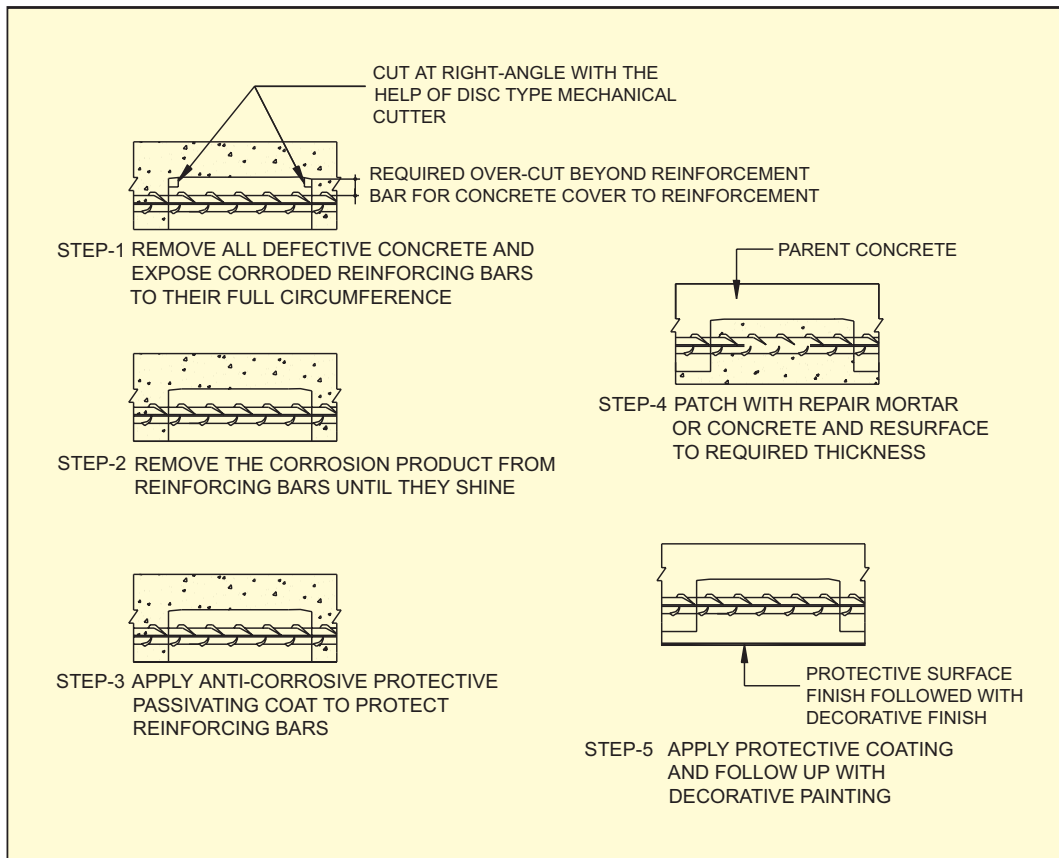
Typical repair procedure for patch repair and corrosion damaged concrete
